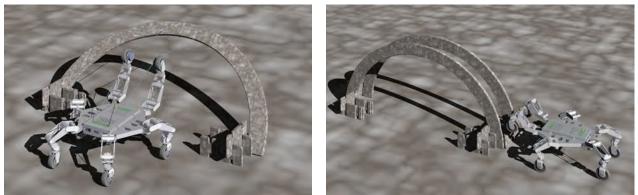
Tilt-up construction of complete monolithic prefabricated beams and arches (left), and placement of prefabricated panels (right)
